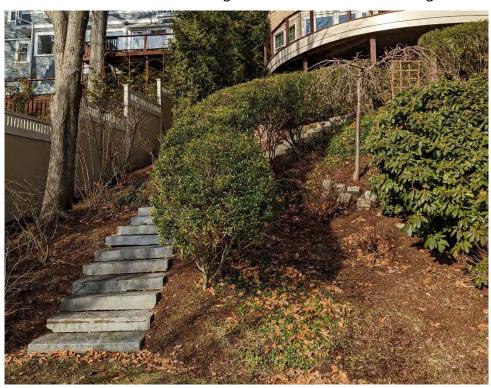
General view from bottom of slope, photo includes existing granite steps facing west
